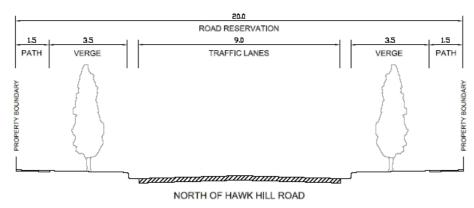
(b) Port Sorell and Environs Street Cross-section designs - North of Hawk Hill Road
